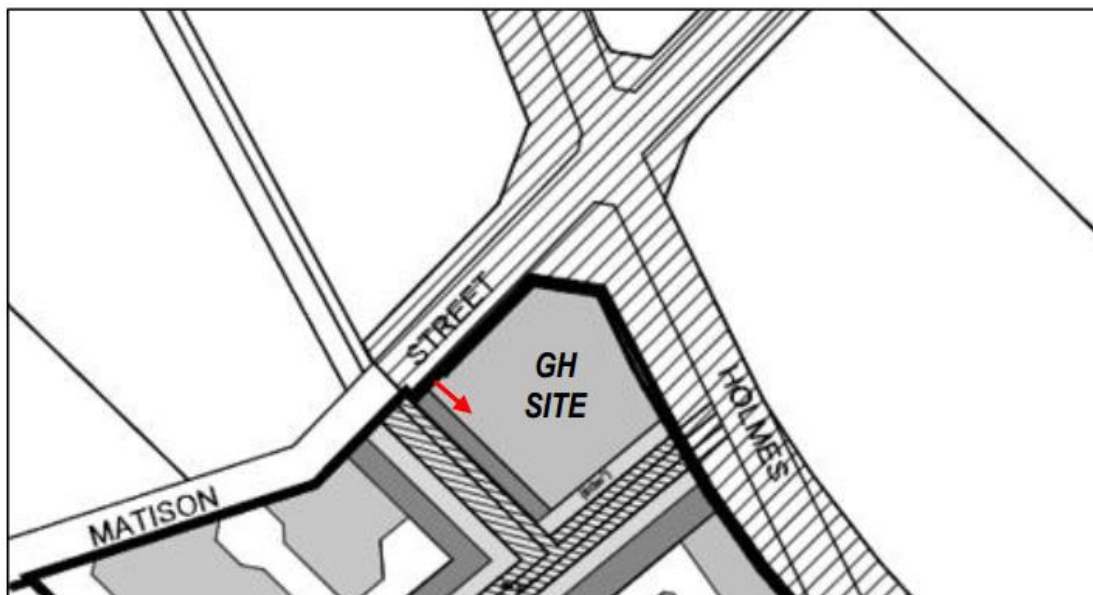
Proposed Access Location to Grouped Housing Site from Matison Street
